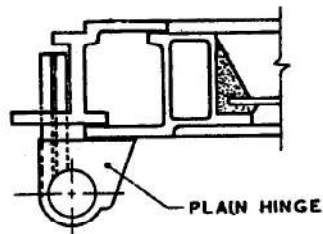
TYPICAL NON-PROJECTING TYPE HINGE FOR DOOR
